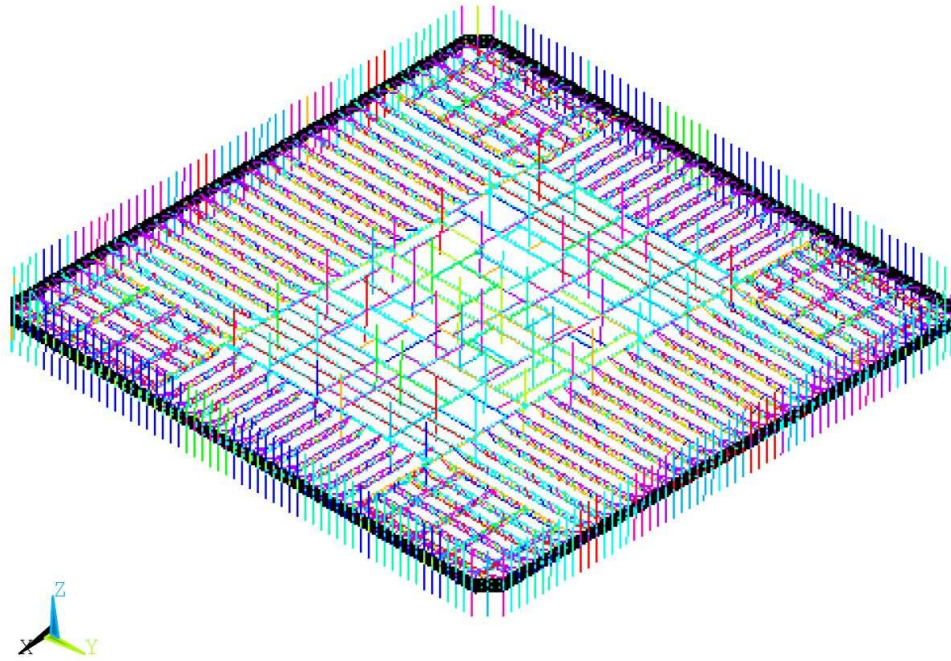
NIST Modified Single Floor Model (Undamaged) [68]
